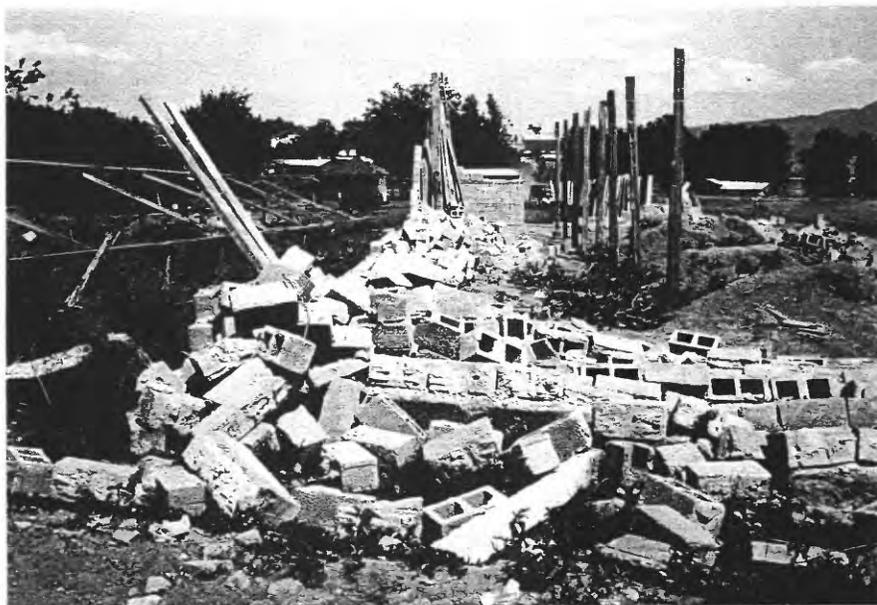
Collapse of an unreinforced concrete block farm building near Skolari.
